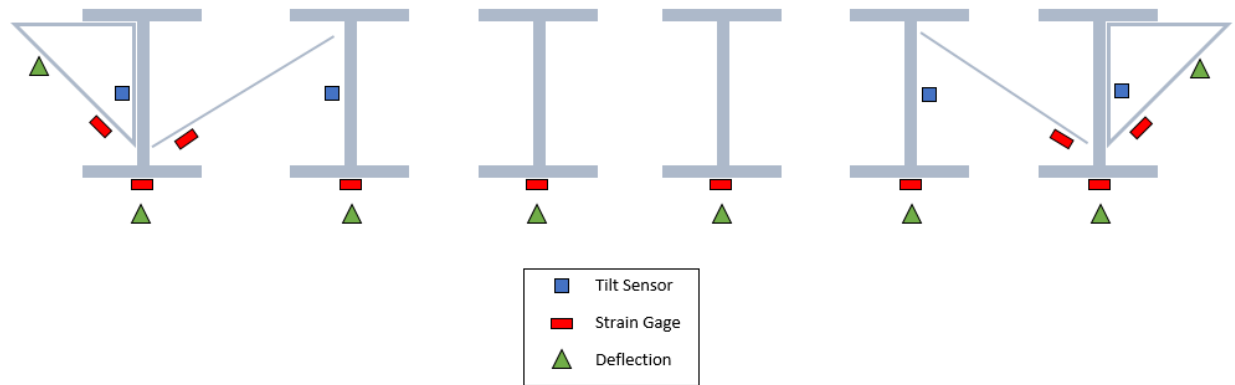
Typical unbraced dry run gage layout for the Maple Bridge
